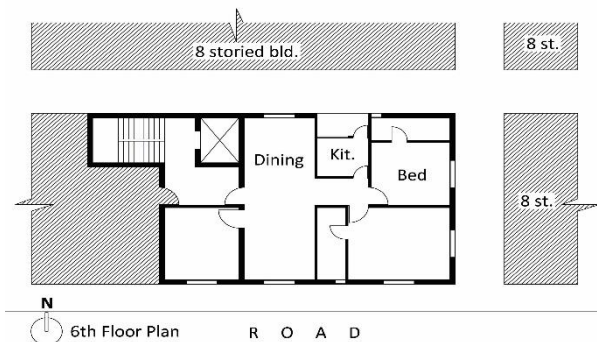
Plan-B where dining room has cross ventilation and bed room is next to kitchen without a buffer space
